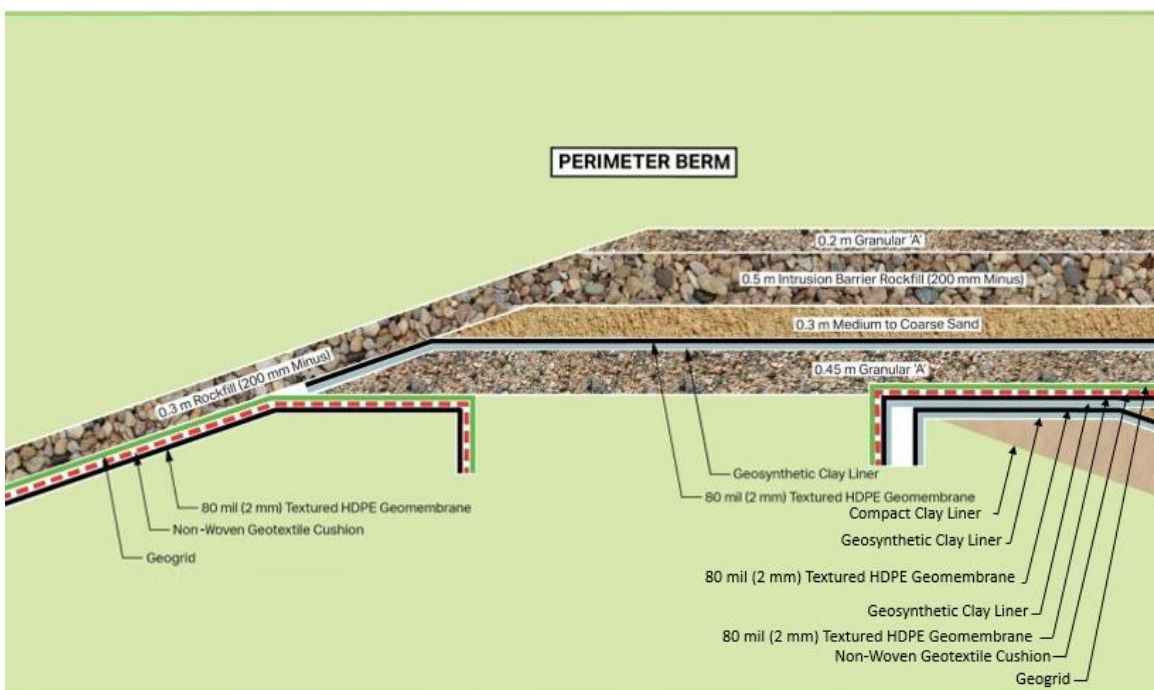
Perimeter Berm Intersection with Base Liner System and Final Cover System
